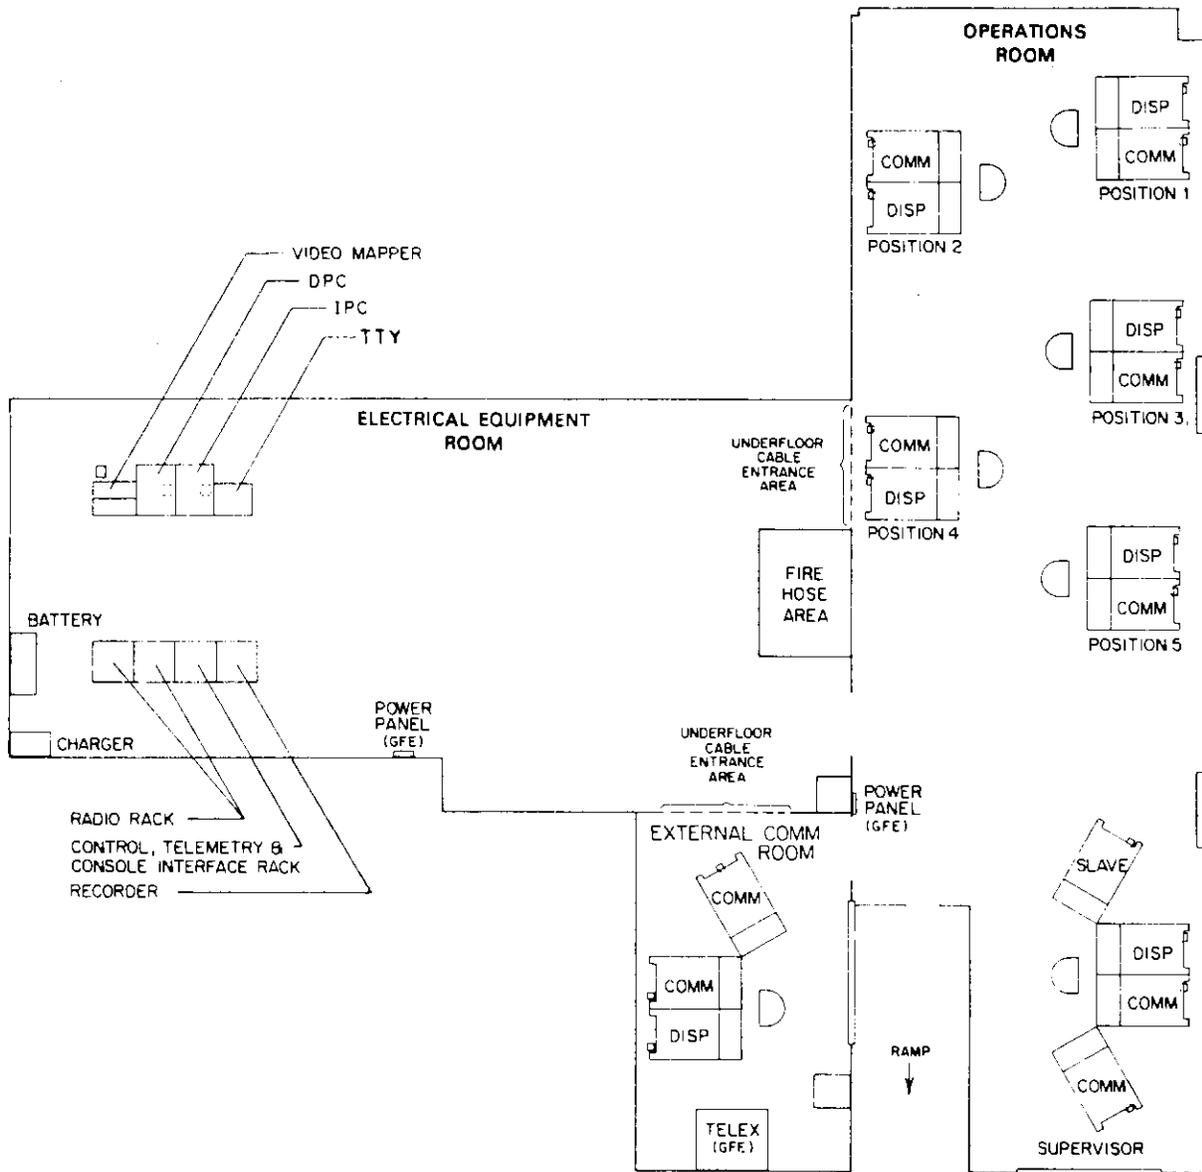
OPERATIONS ROOM LAYOUT
